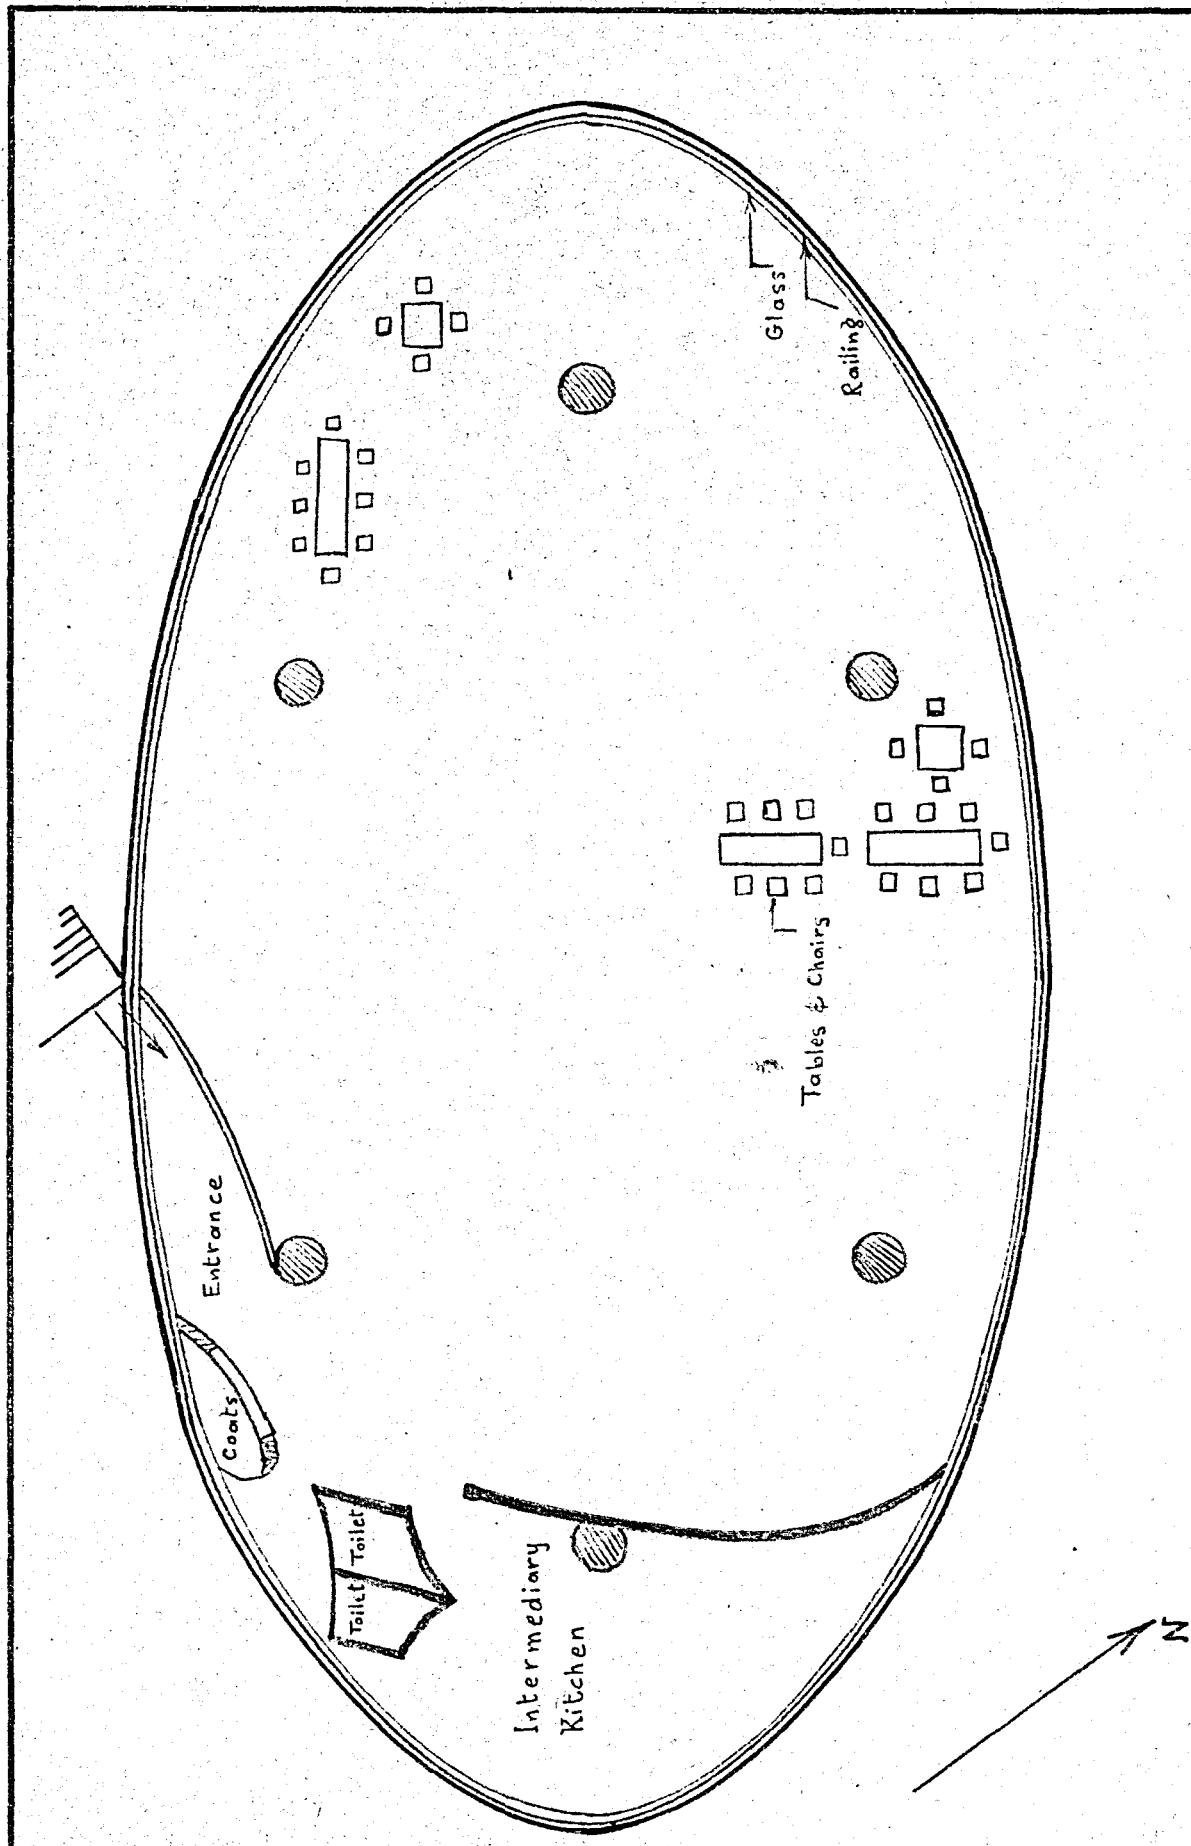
Interior Plan of the Casino's Restaurant (Scale 1/200)
